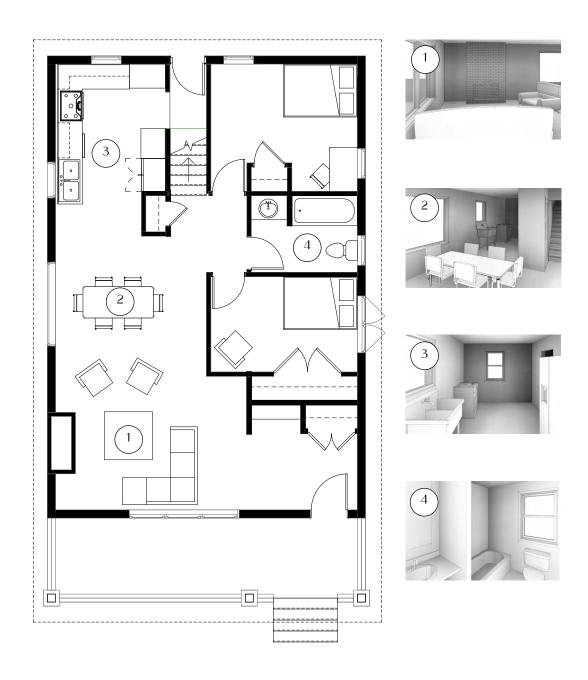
Proposed First Floor Plan, scale 1/8"=1'
